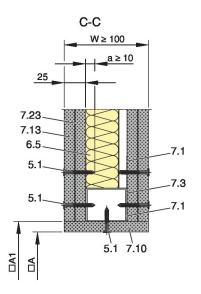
Compartment wall with metal support structure and cladding on both sides
